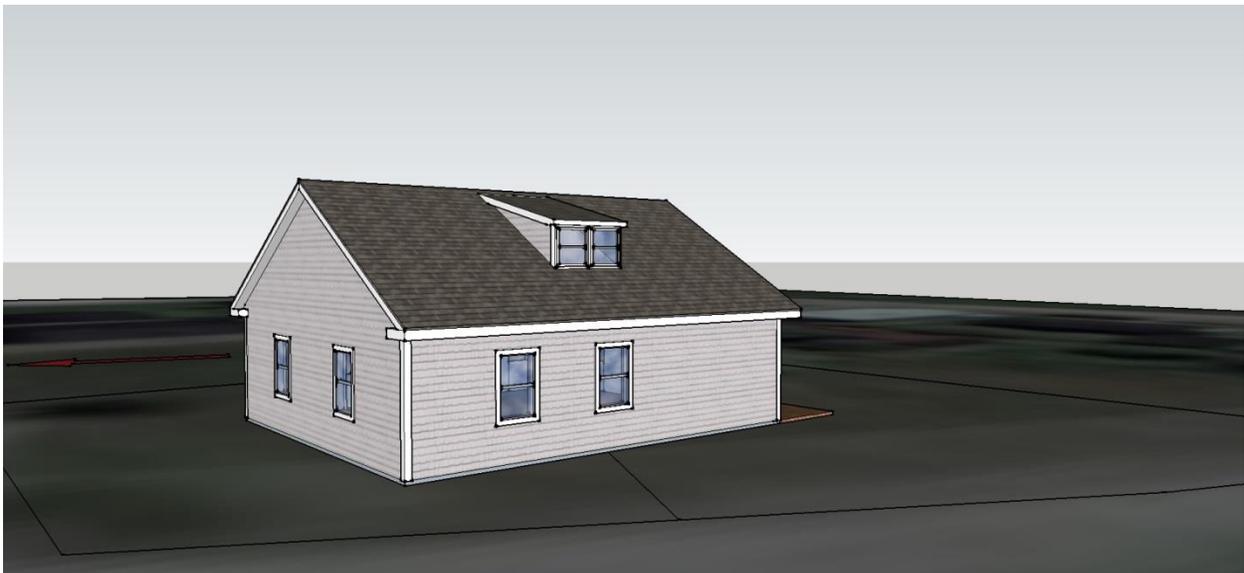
Looking east from the Whitney Pier Heritage Trail (Railroad Street) showing "dummy" shed dormer that could be placed on either the eastern or western roof slopes.
